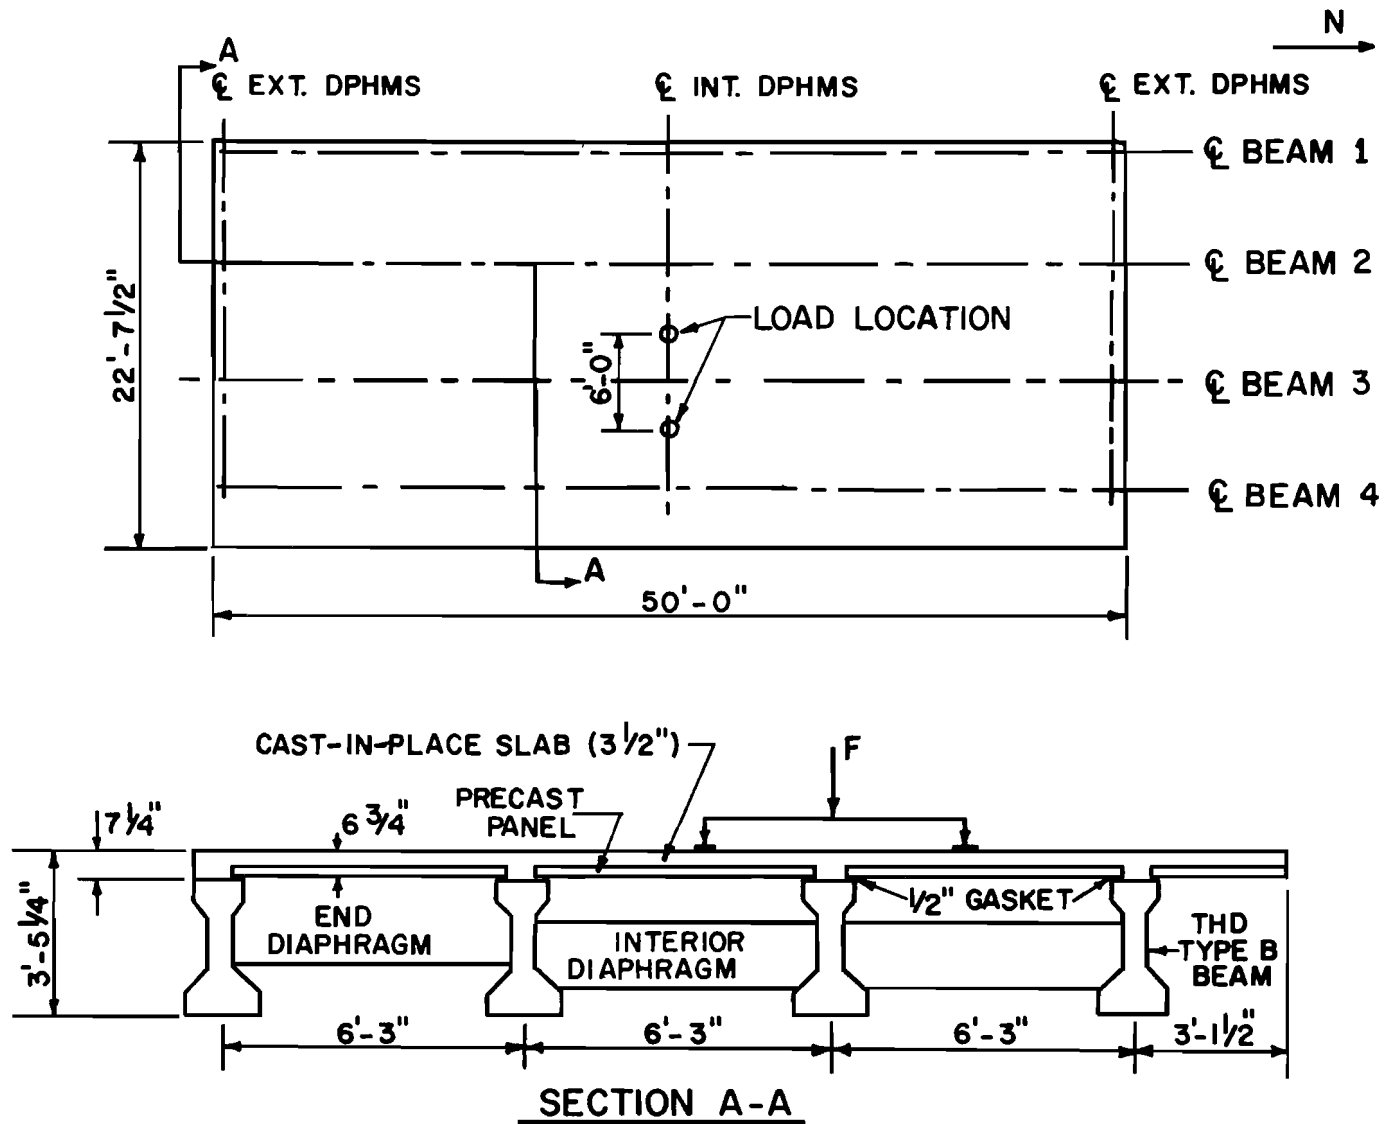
Full scale model of prestressed concrete panel type bridge (taken from reference 13).
